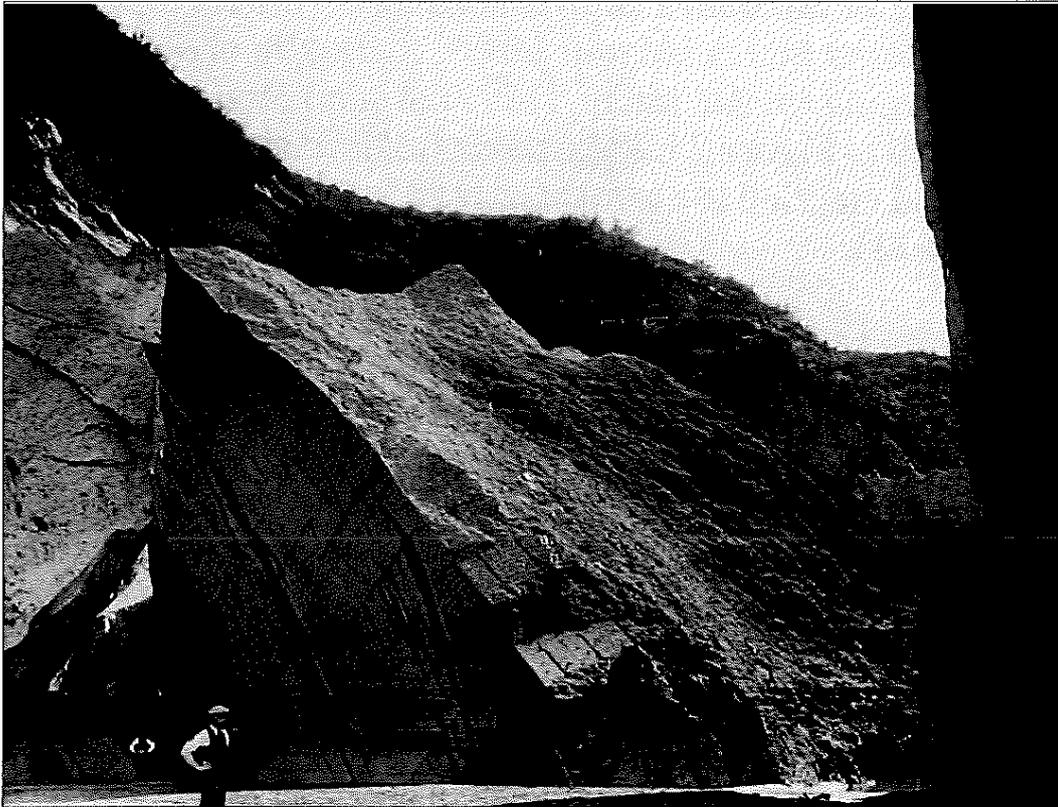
Blocks of concrete after failure, note size of men for scale (Huber Collection, U of Cal Water Res Center Archives)
